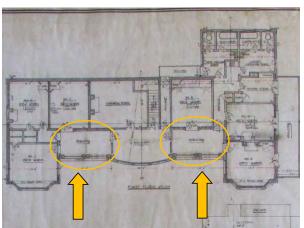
Original first-floor plan showing the open balconies at first-floor level.
